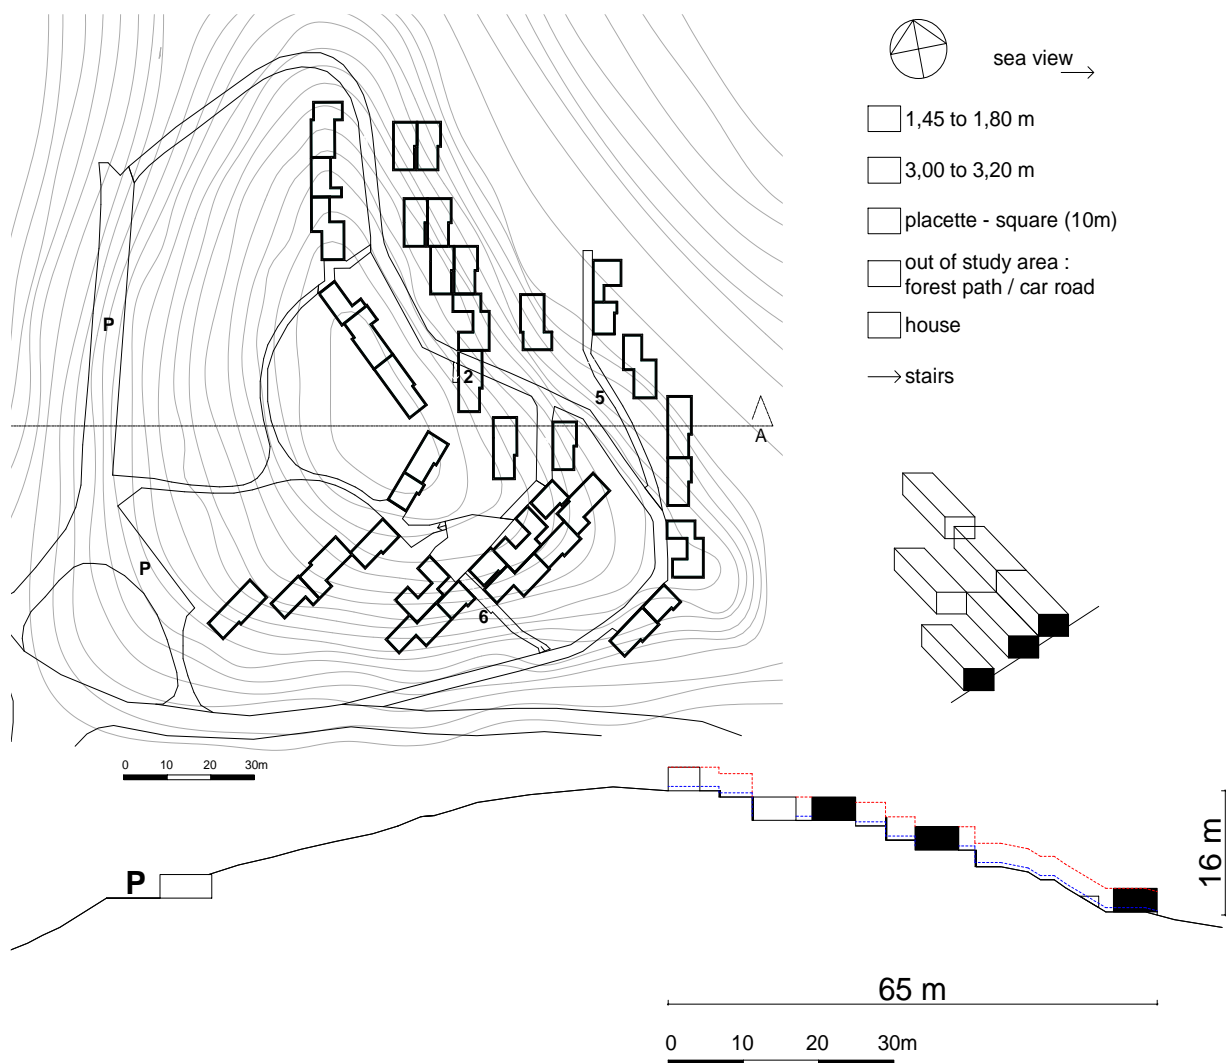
Gaou Bénat: Left: Ground floor plan with pedestrian street widths, slope contour lines, and SVF locations
